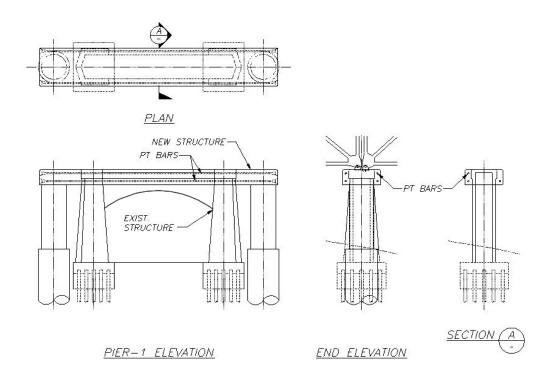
Steel Truss Approach, Pier 1 – Rehabilitation Option 1
